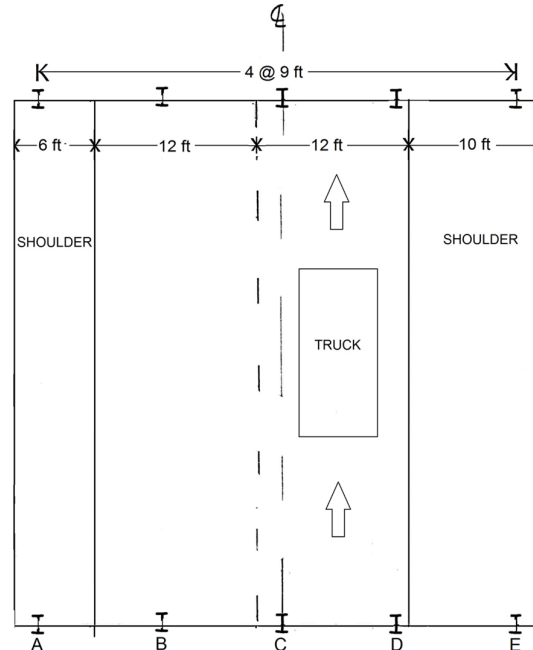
Schematic of bridge lanes and girders for bridge A-6243 and T-130
